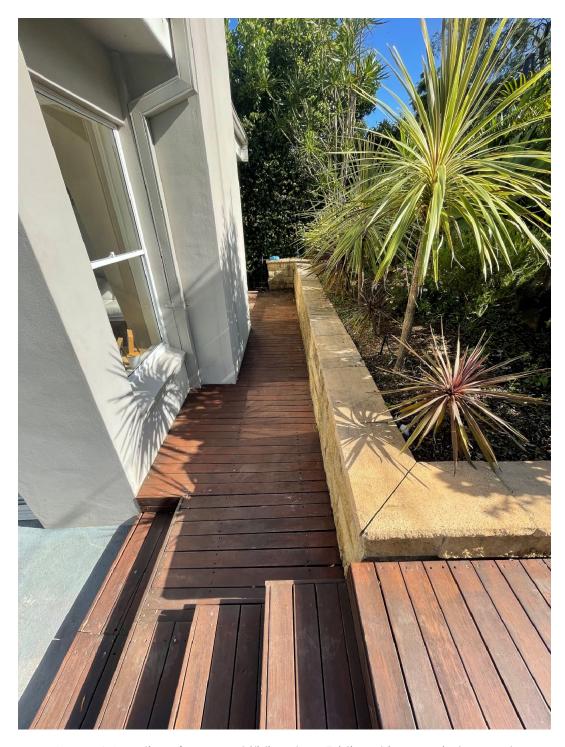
Location of proposed Sliding door. Existing chimney, windows and decking to be removed. Screen planting on adjoining property shown.
